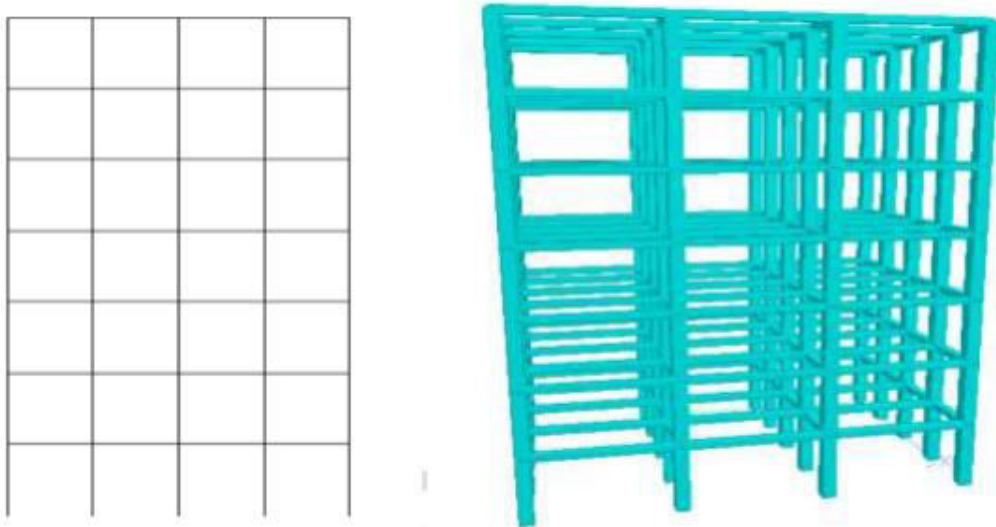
Frame of the proposed Structure and 3D presentation of the Hospital Building (Without Slab)
